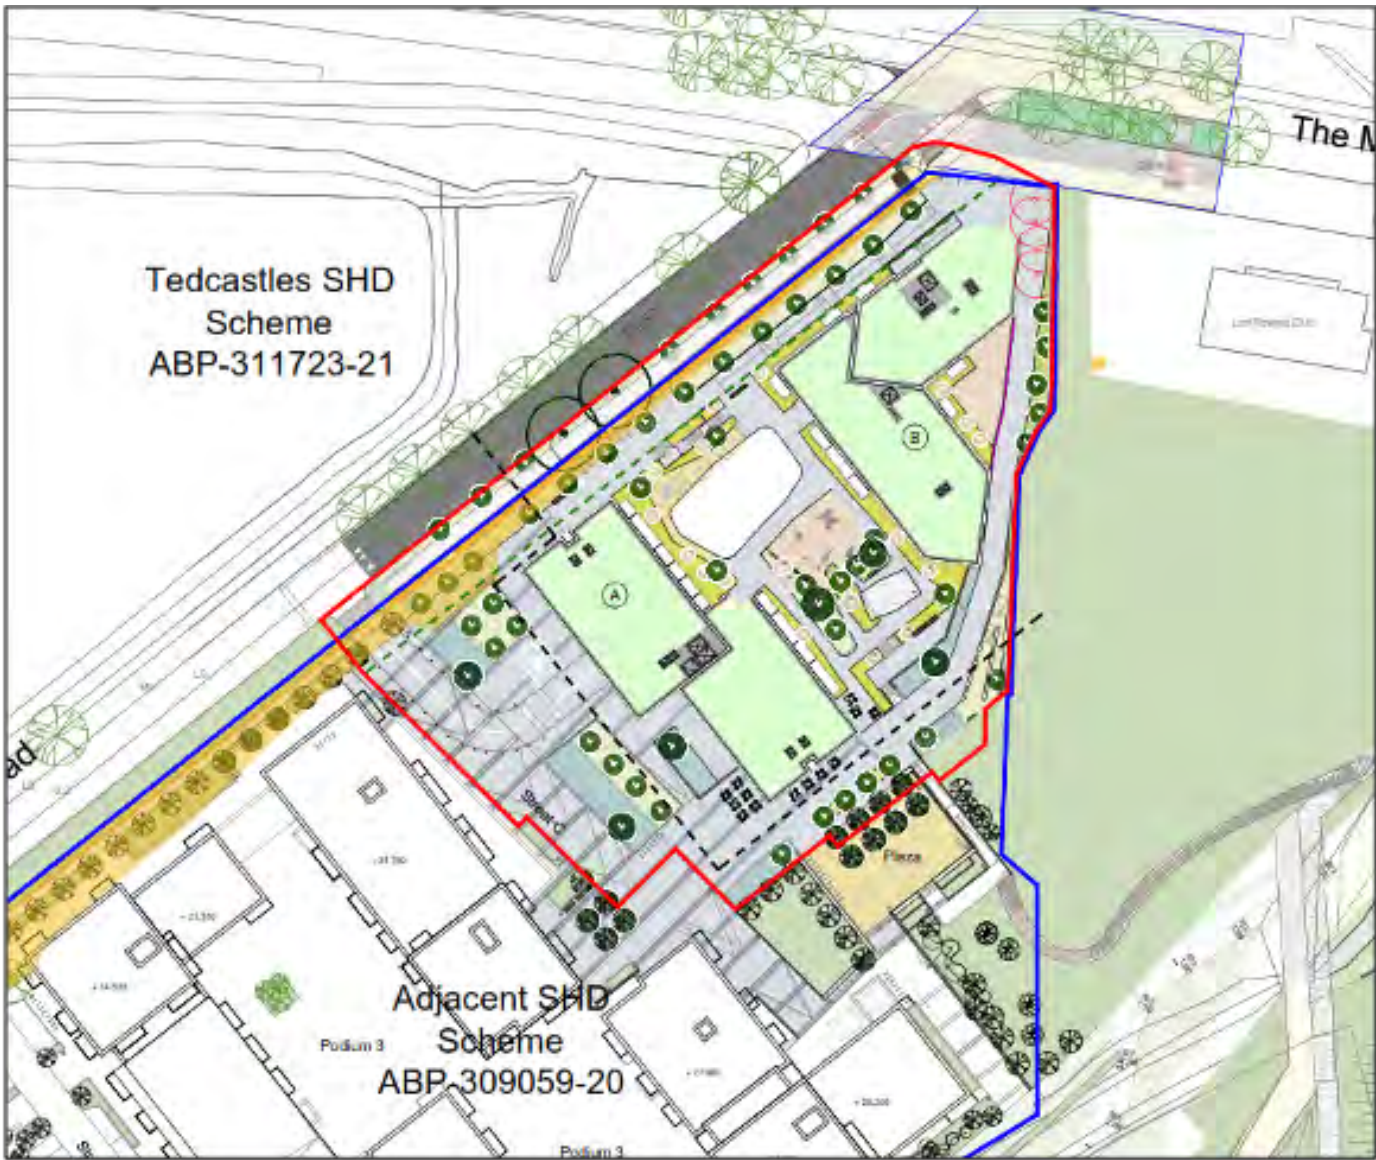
Proposed Development Site Layout (Source: John Fleming Architects (JFA))
